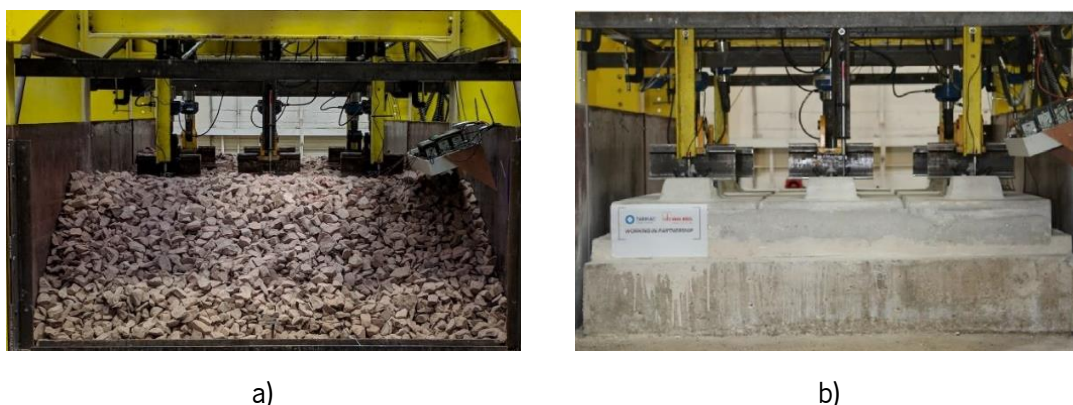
Railway tracks: a) ballasted track; b) ballastless track
